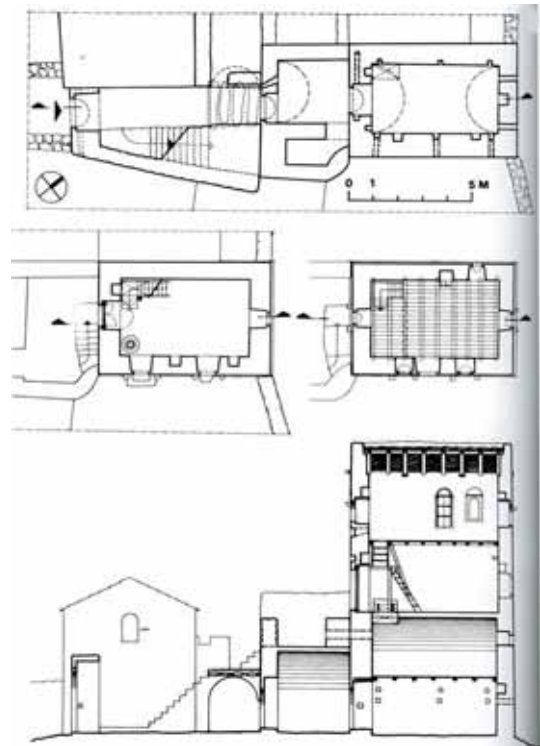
The Oikonomeas tower-dwelling. Above: ground floor plan. Center: left, third level plan; right fourth level plan. Below: lengthwise section. (*Saitas, 2001*)
